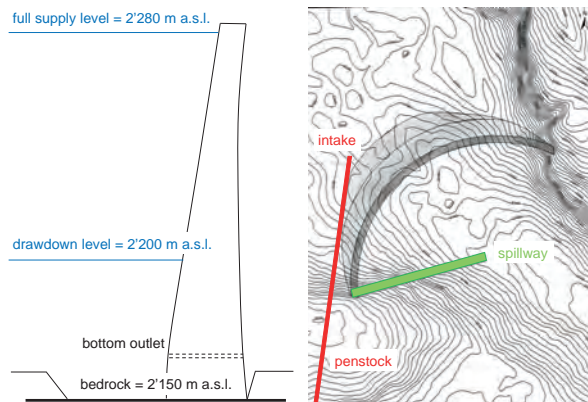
(left) cross section of the arch dam; (right) situation with arch dam, spillway, and penstock
